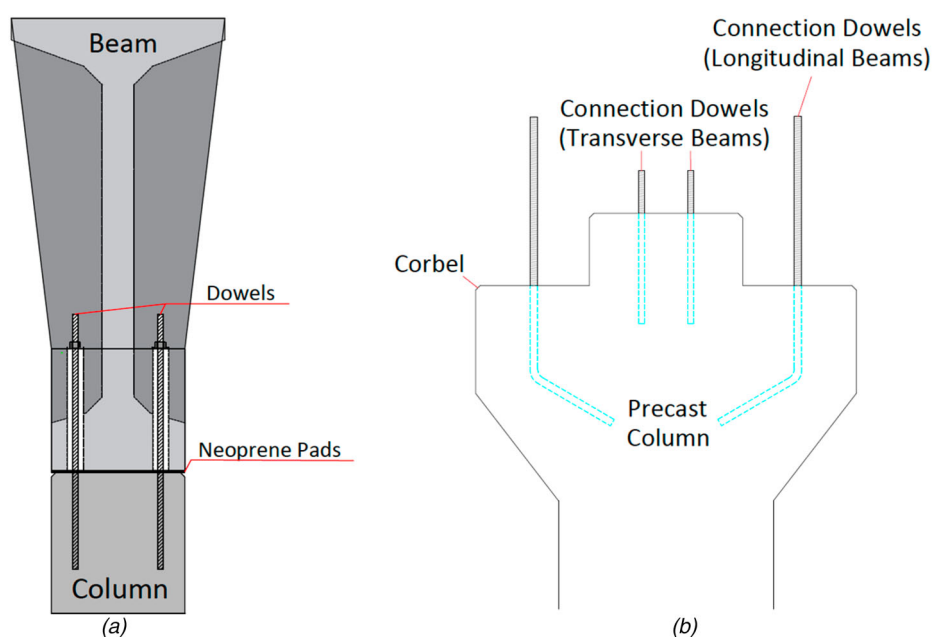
Scheme of conventional European beam-to-column dowel connection: (a) beam-to-column connection; (b) central column detailing
